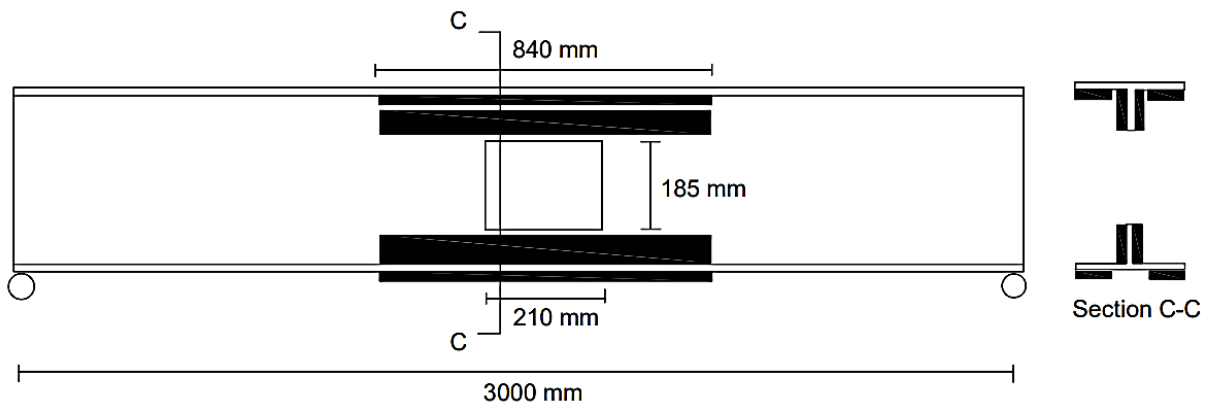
Specimen B1-R0 strengthening arrangement .
